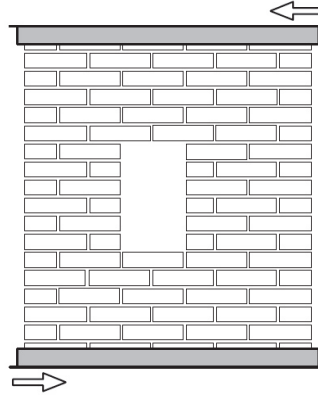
Wall with central opening tested by Raijmakers and Vermentlfoort [1993] [86]
